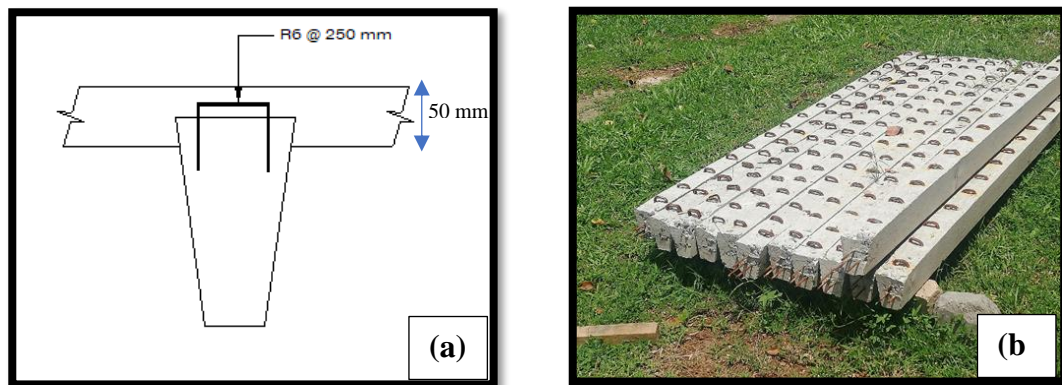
(a) Systematic diagram of modified connection; (b) Cast beams with modification.
